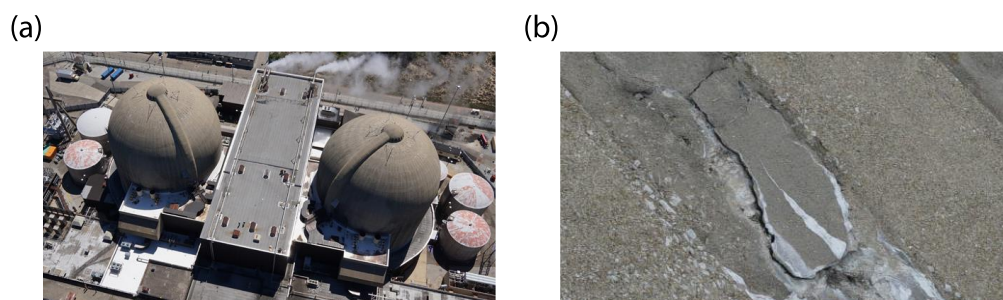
Examples of structural monitoring in nuclear applications. (a) The exterior of the reactor containment buildings, such as the DC Cook power plant domes [43]. (b) Example of concrete cracking and spalling found there [43].
